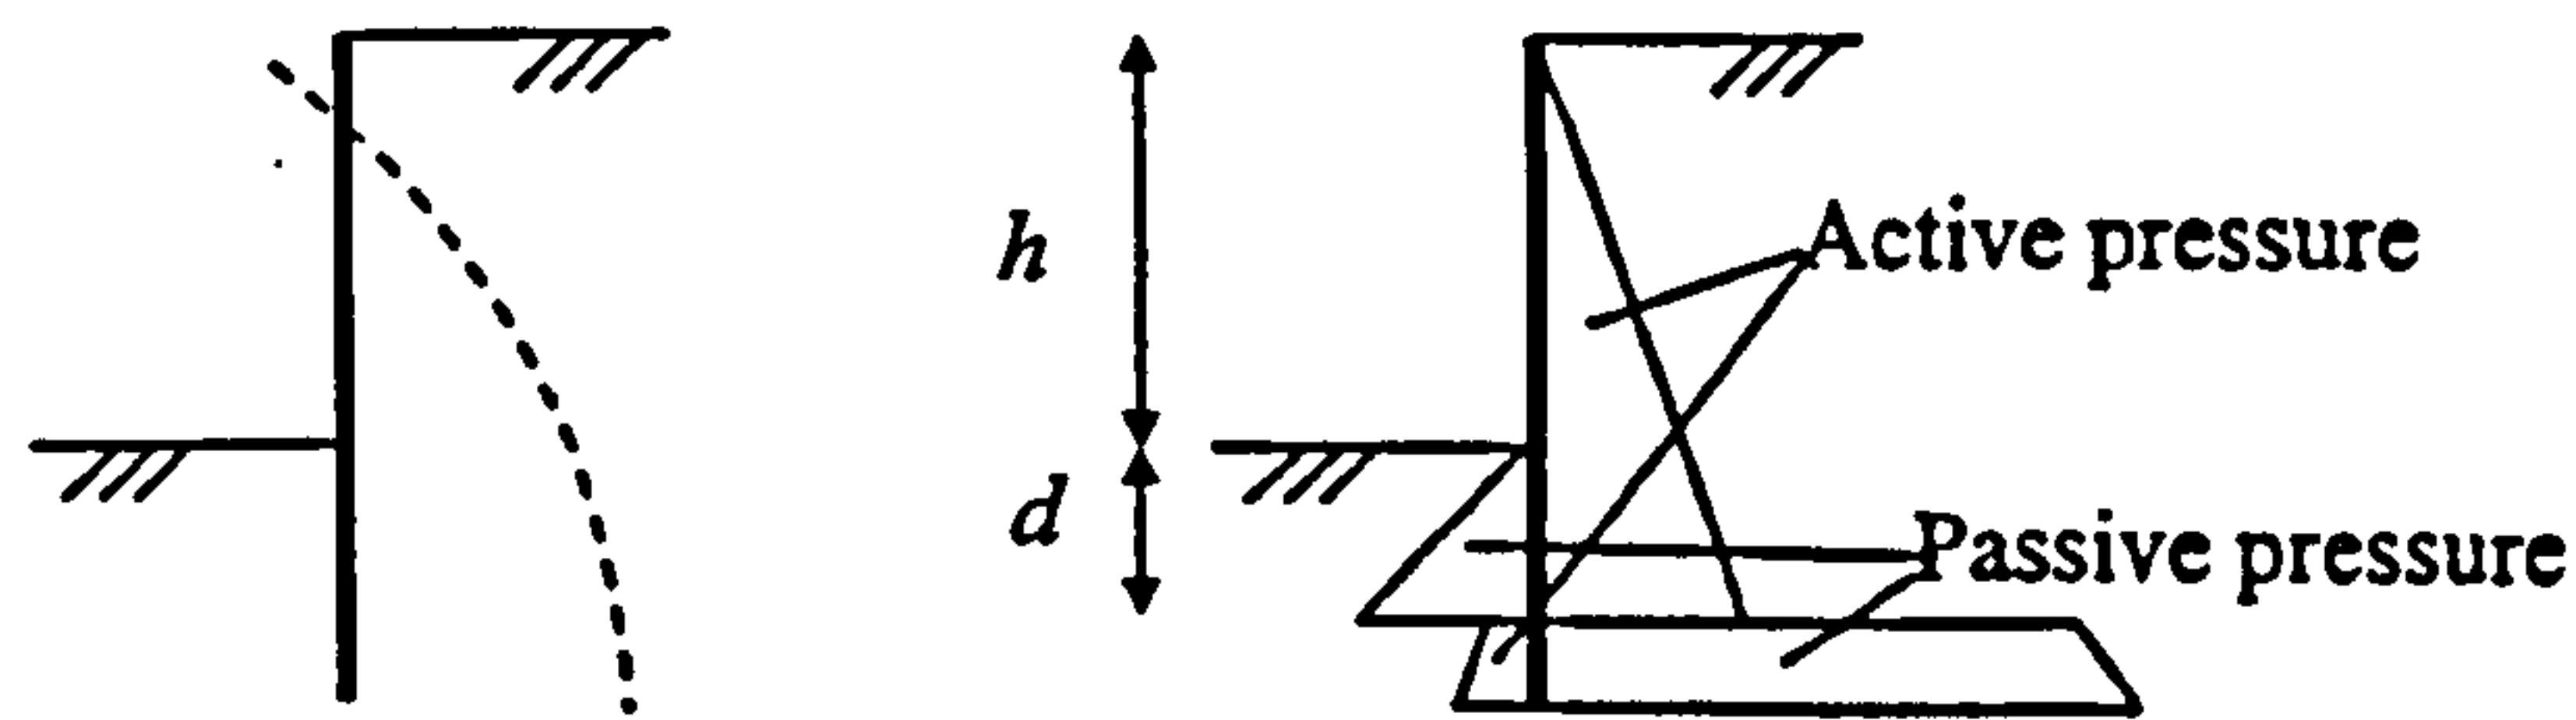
Failure of a non-anchored sheet pile and resulting earth pressures
